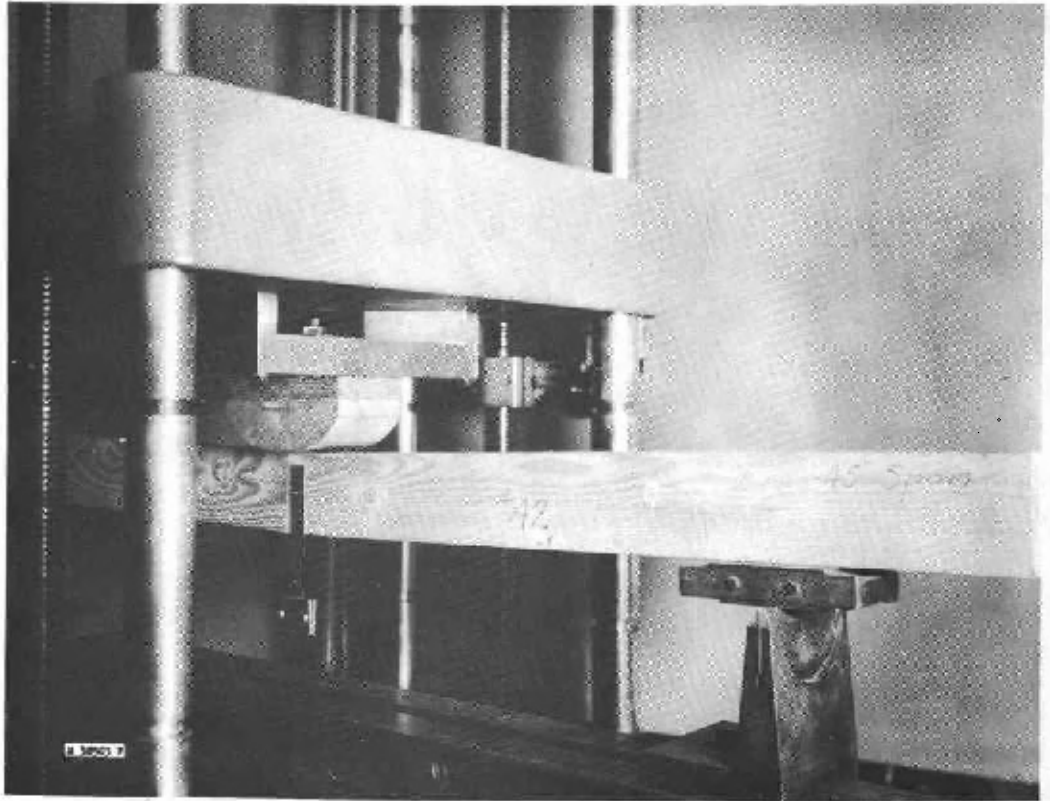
Apparatus and arrangement for testing specimens in edgewise bending over a span of 45 inches with splice and load at center of span.
